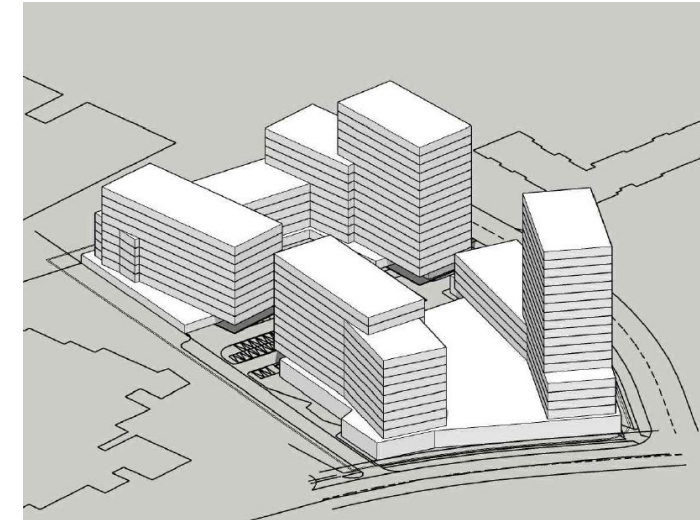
Building 3D rendering - internal courtyard view from the main east-west internal road
